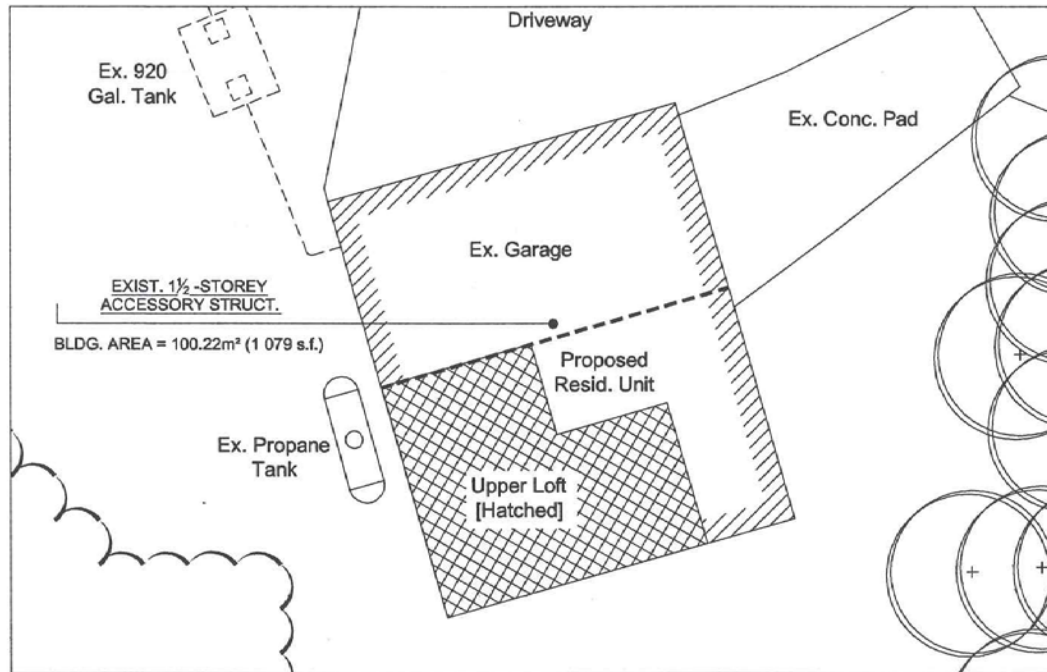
Overall Site Plan Excerpt Source: J. Wells Architect Inc.
